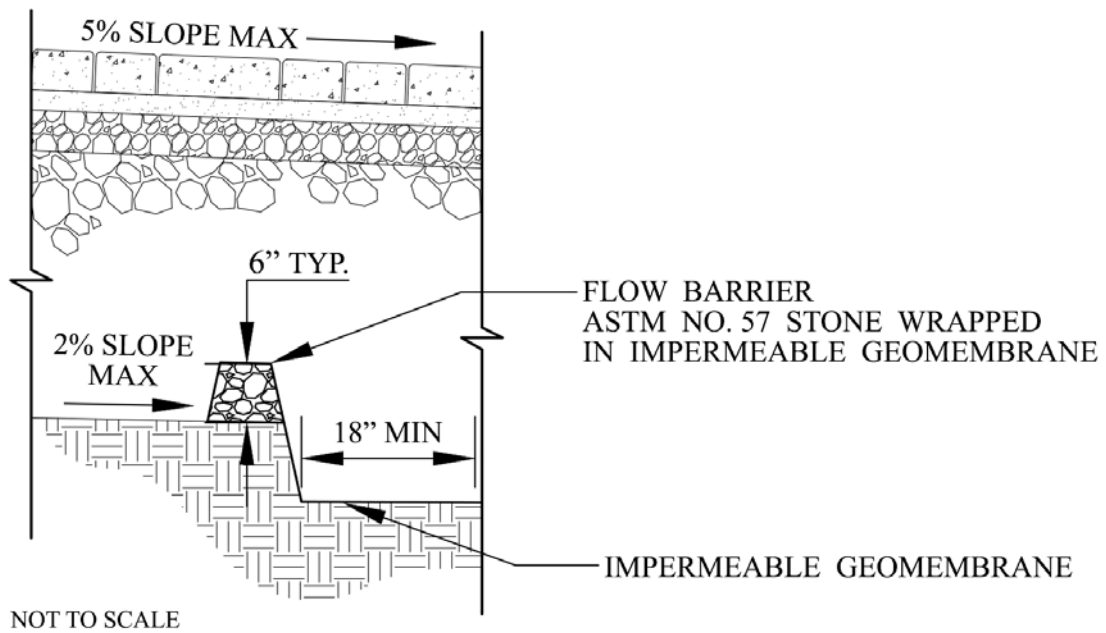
Pervious Pavement System on Slope Detail, *image by Author.
